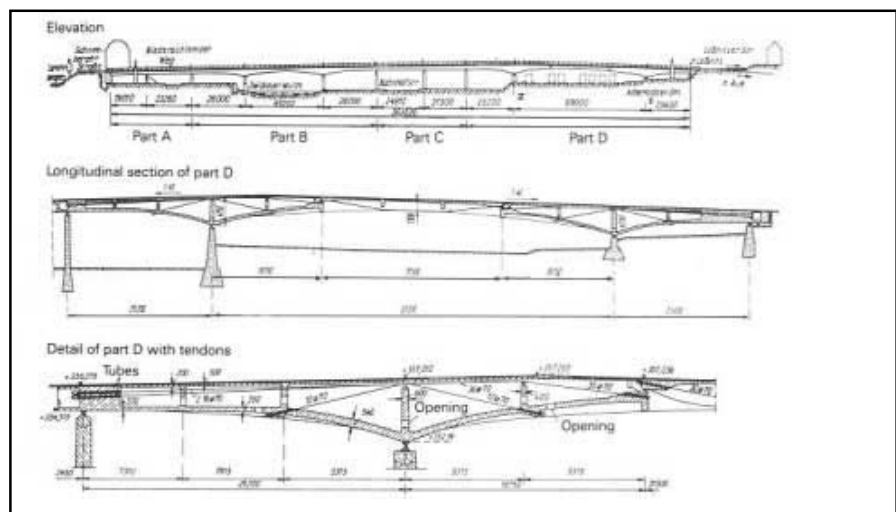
First prestressed concrete bridge: Bridge over valley basin and railway at Aue, German Democratic Republic (designed by Dischinger)
